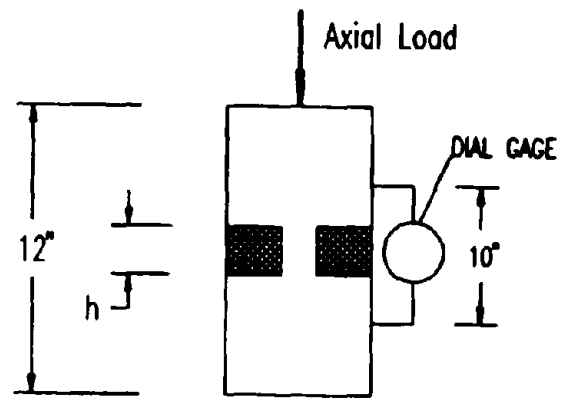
Plain Concrete Hinged Specimen Instrumentation Details.
